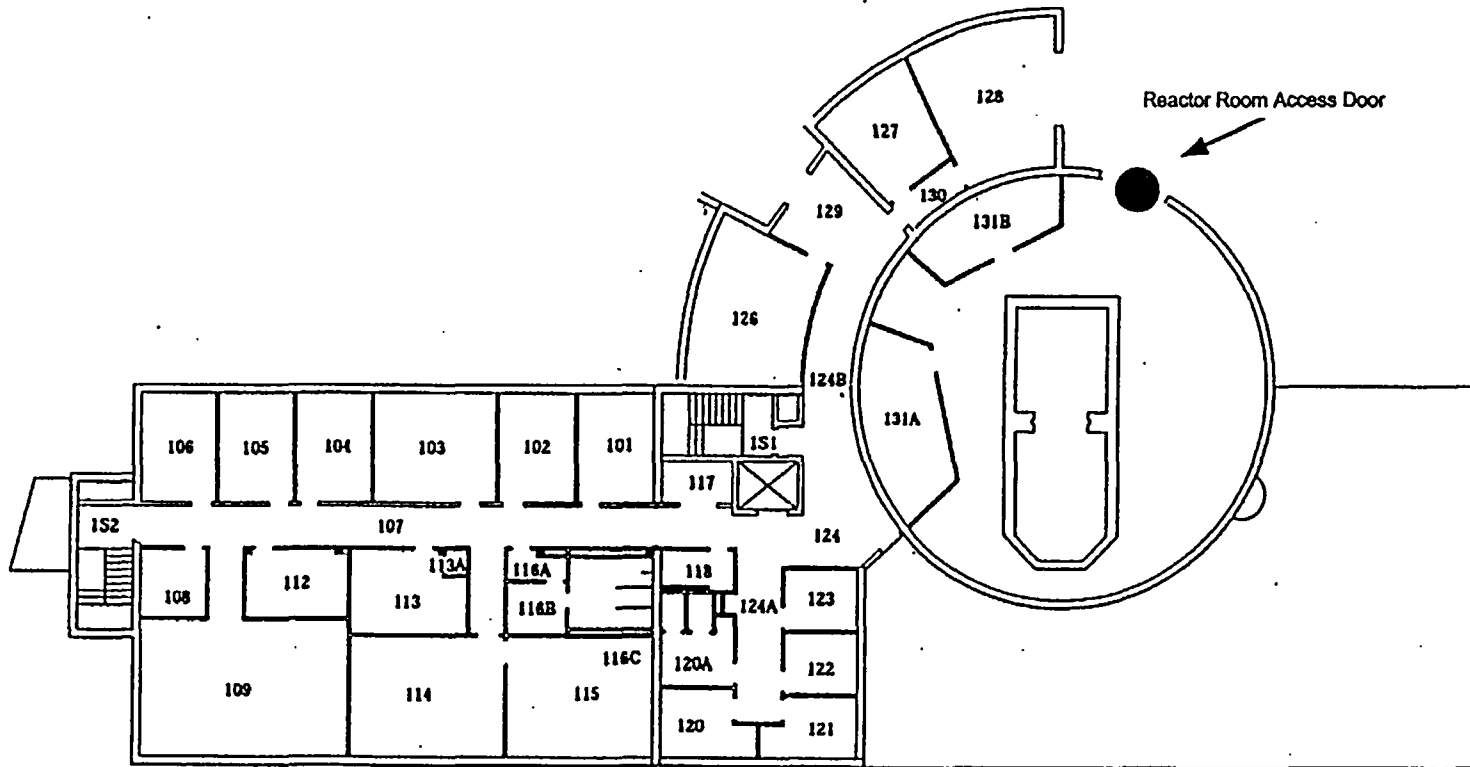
UVA Reactor Floor Plan View Indicating Roof Areas.
